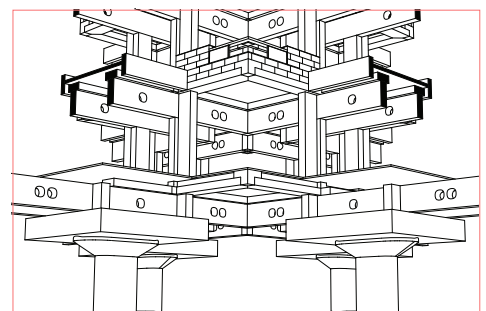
exception 3. underground structure (J.Lim, 2017)
